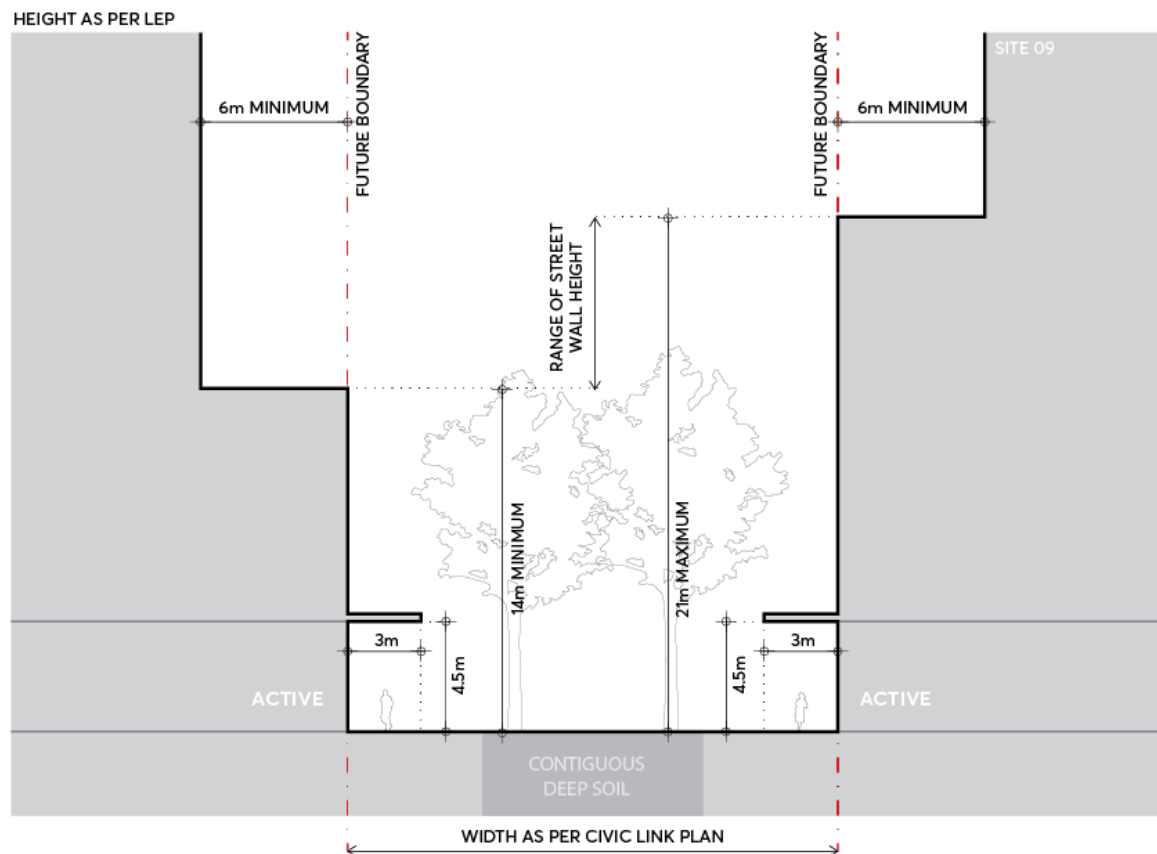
Future Civic Link in Block 3 (Section H) Setback & Building Height
